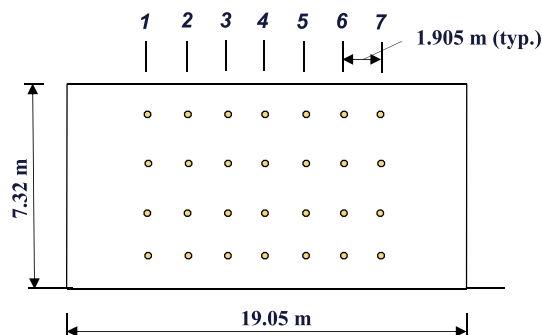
Tap layout: a building (width 19.05 m, elevation 7.32 m)
